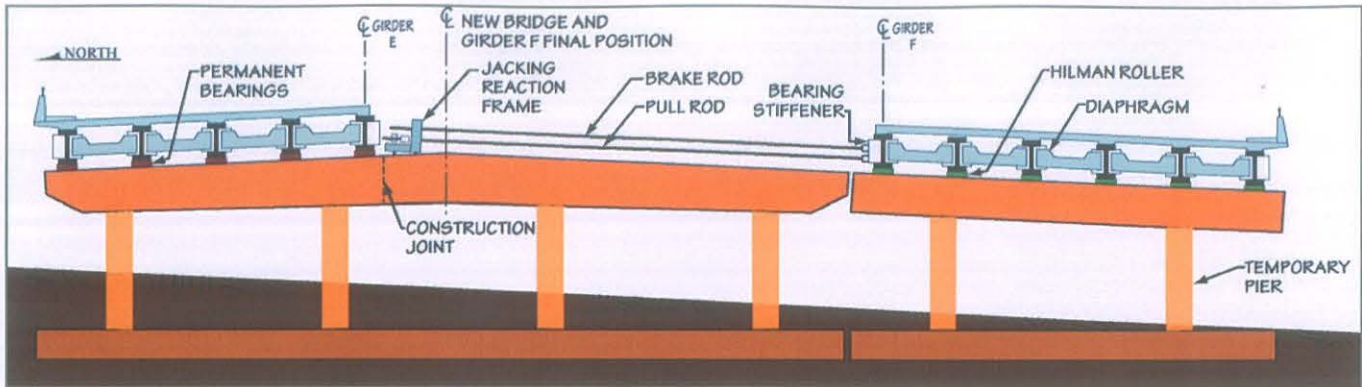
A sectional view of the NE Eighth Street bridge prior to rolling the south half.
